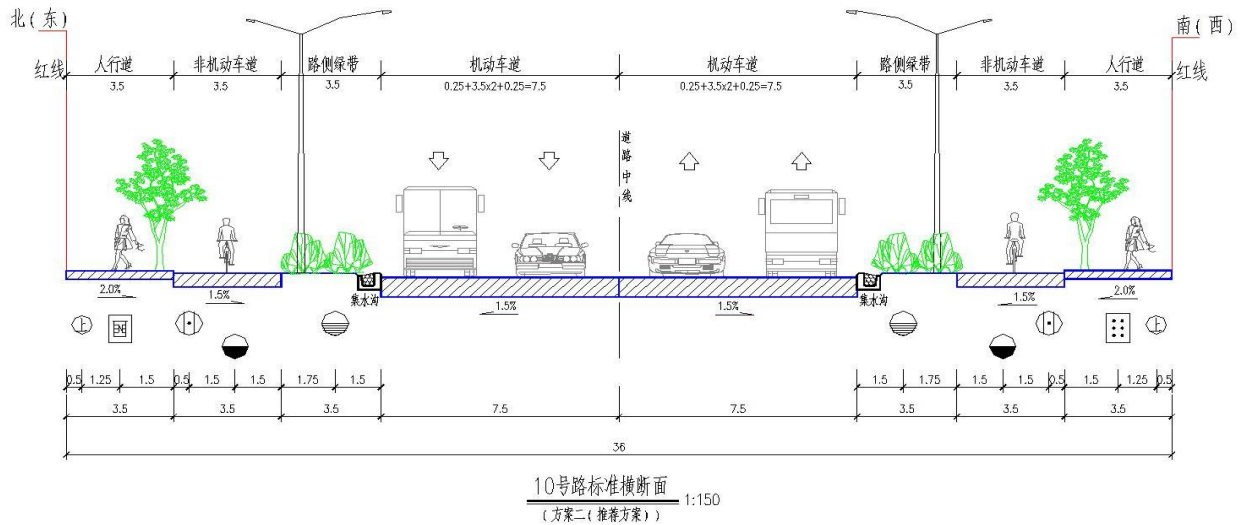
Cross-sections of No. 10 Road in Chuxiong
